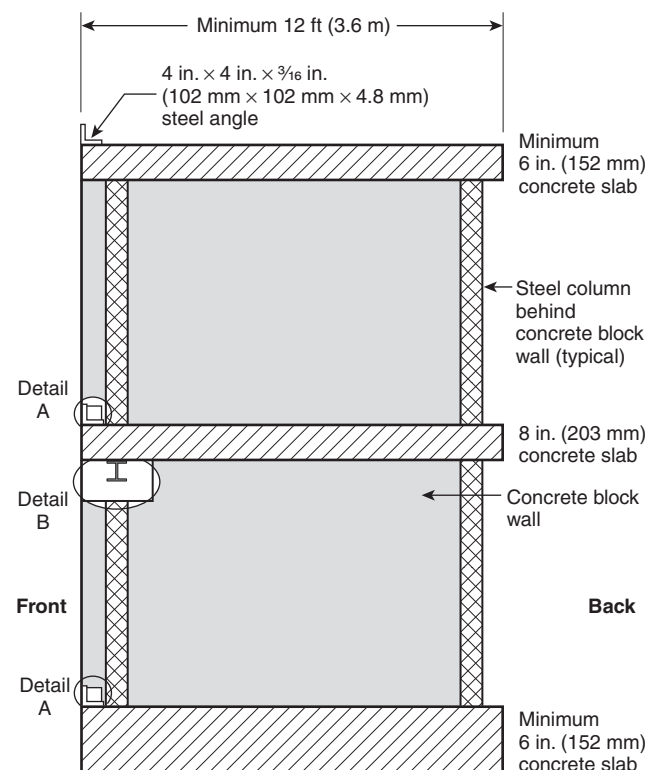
(b) Section View Through Test Apparatus (not to scale). For Details A and B, see Figure A.4.4.3(c).
